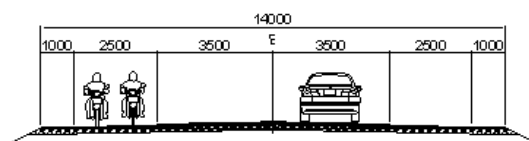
Cross Section of Sri Sophorn Bypass
